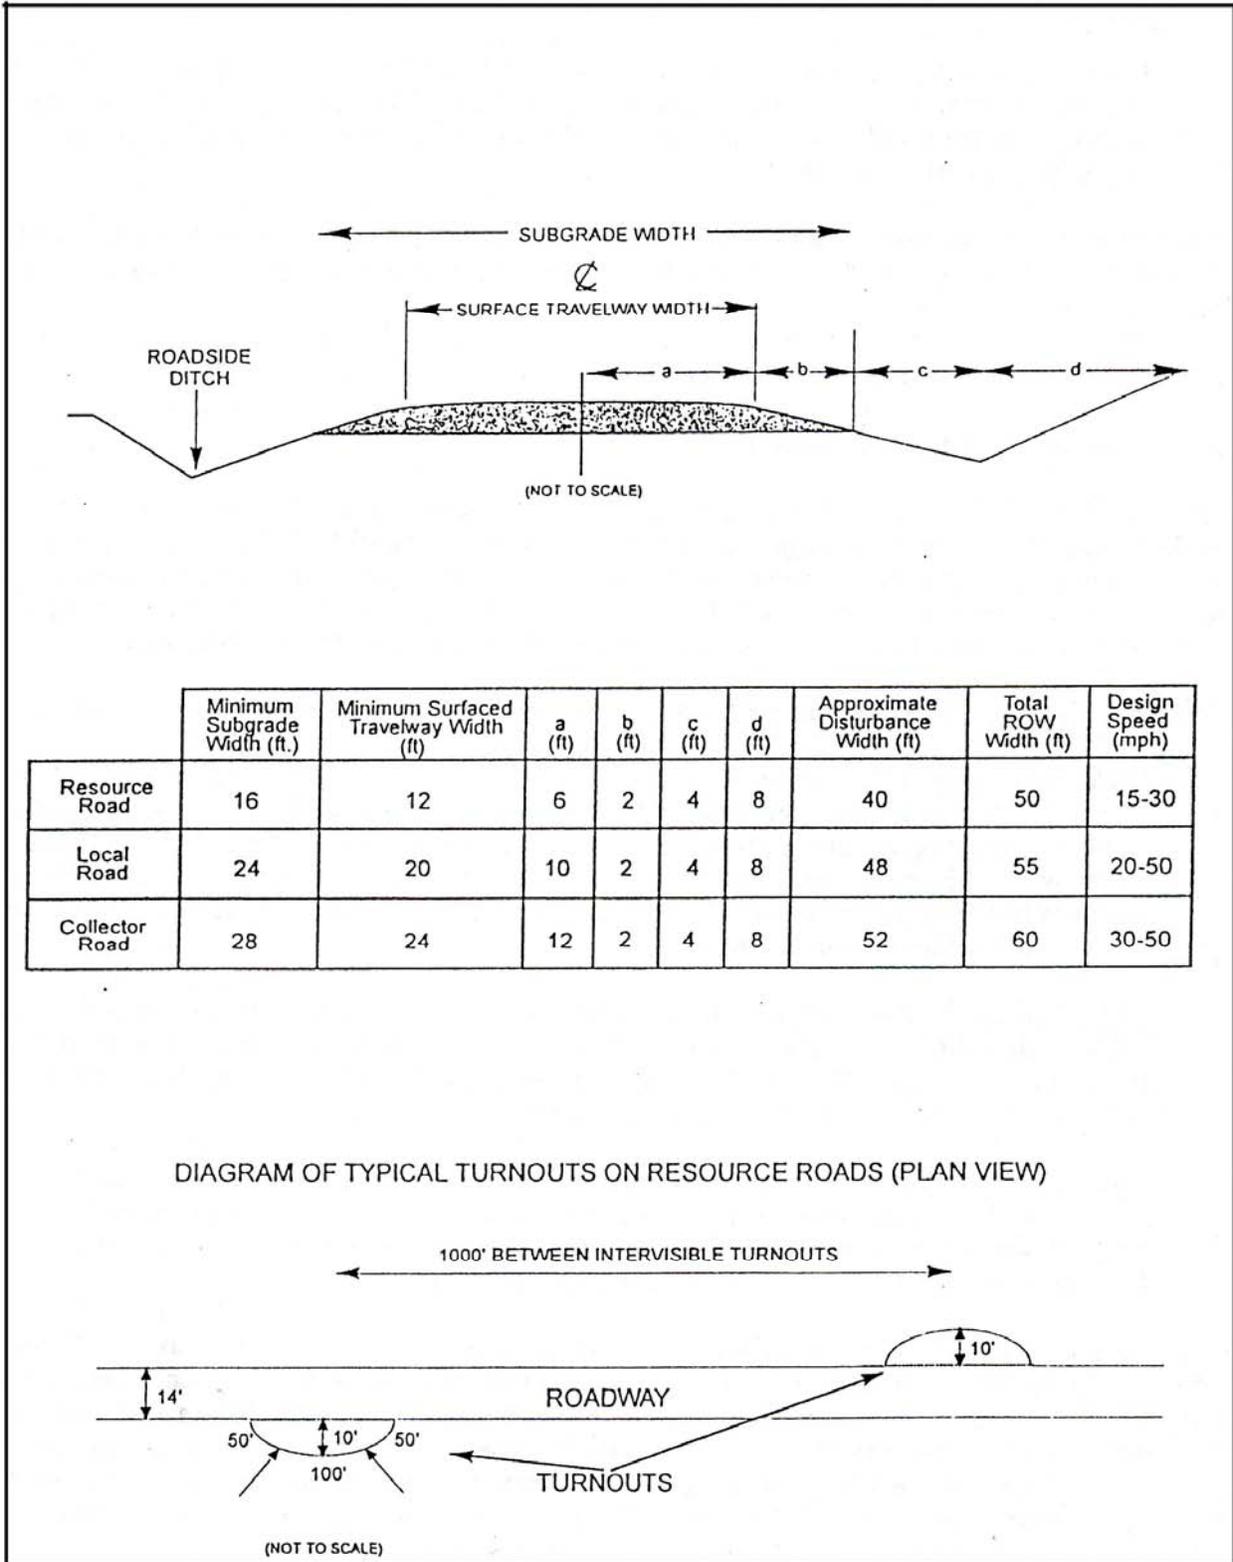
Typical Roadway Cross-Section with Width Specifications
